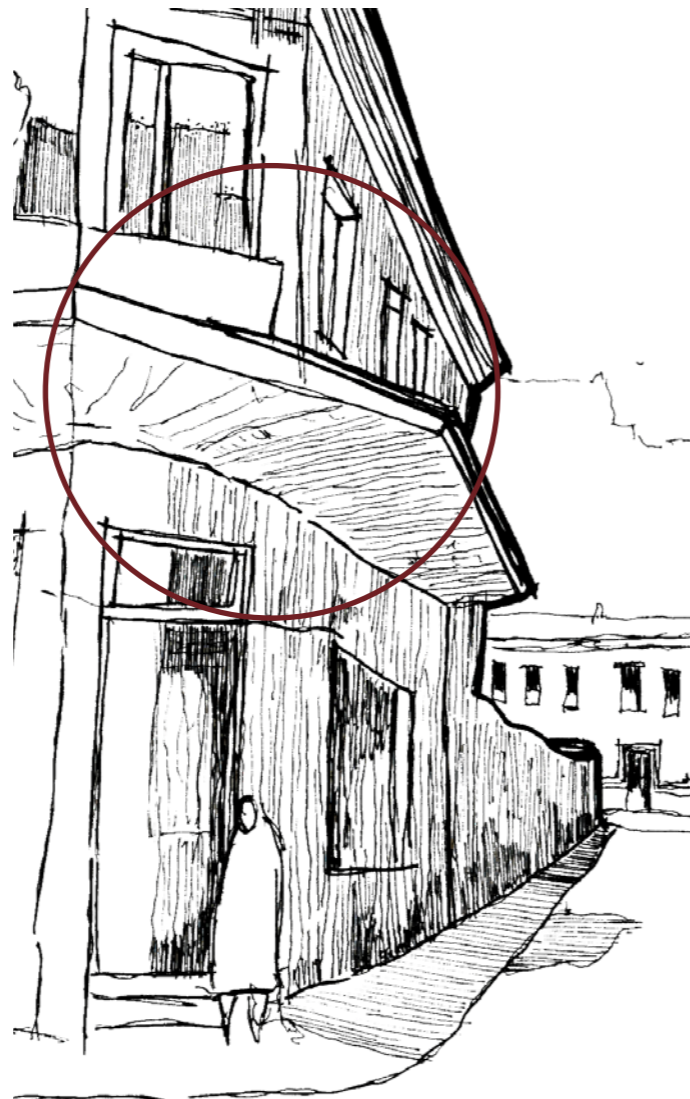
Sketch indicating the walkway with plastered wall balustrade above
